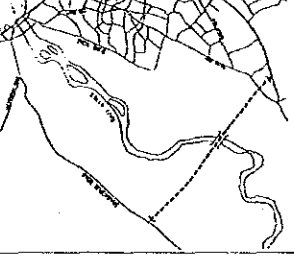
Alternative Location Plans of the Additional Bridge
